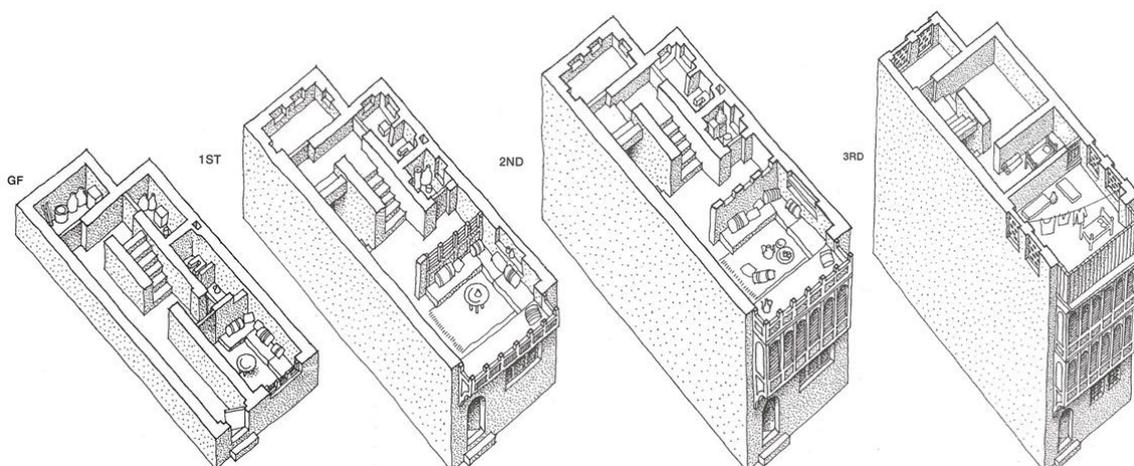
Multi-Story plan of a traditional house in Mecca. Source: (Ragette 2003)
